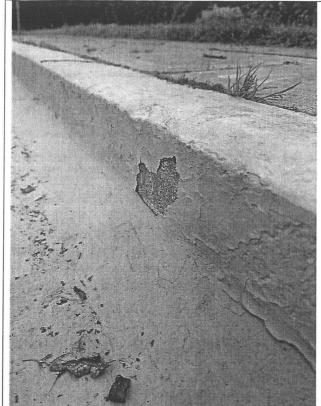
1 isolated paint delamination to the upstand wall of the pool tank
